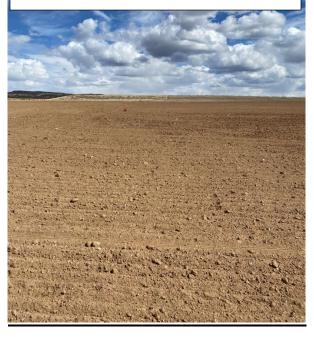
SL-27 reclamation at the eastern section. Photo 8 was taken looking to the north.
